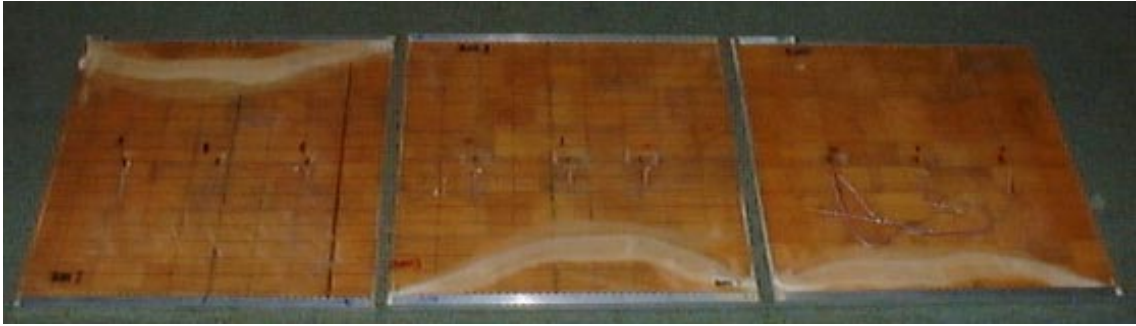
panel B5 shown after failure in the test fixture (SSSS condition)
